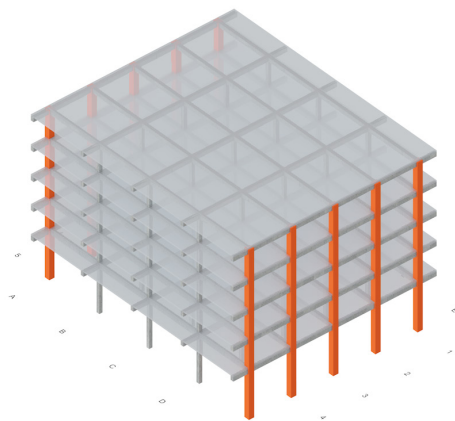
Column jacketing applied to all columns based on the engineer's choice (author's own work)
